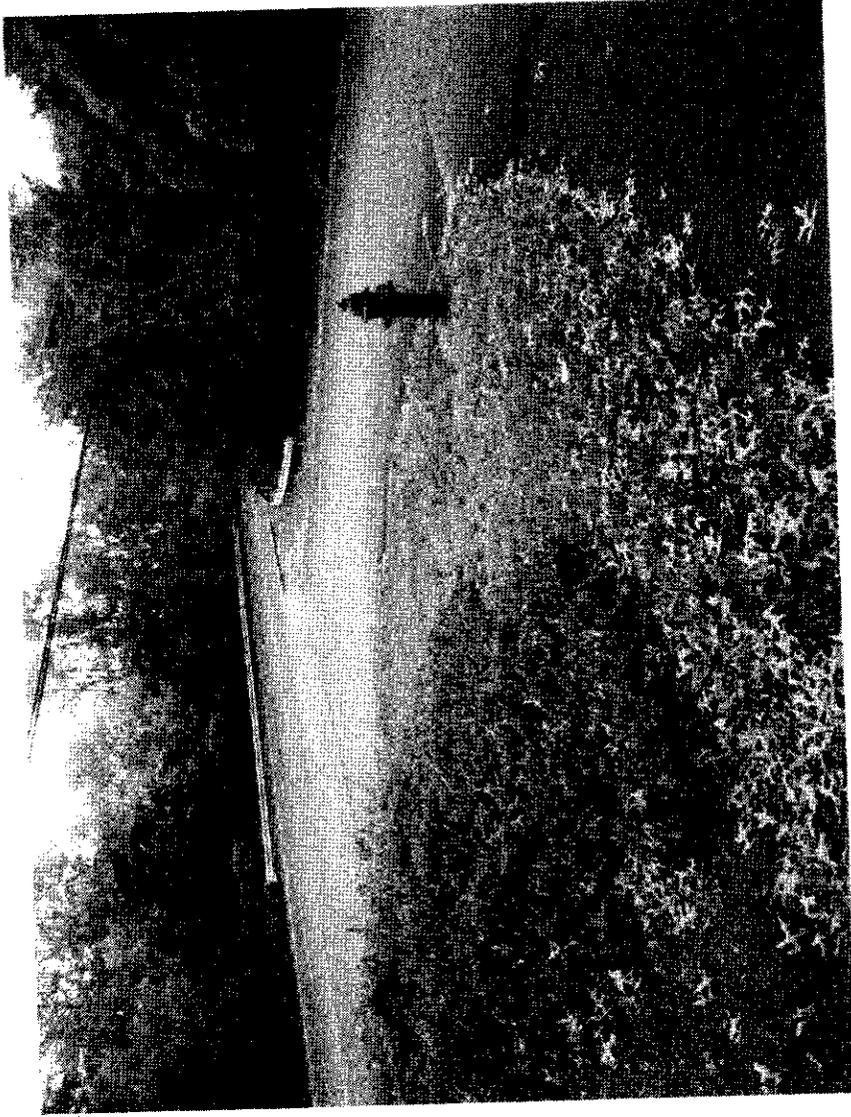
From Inside Parking Lot – Southwest Facing Northeast
